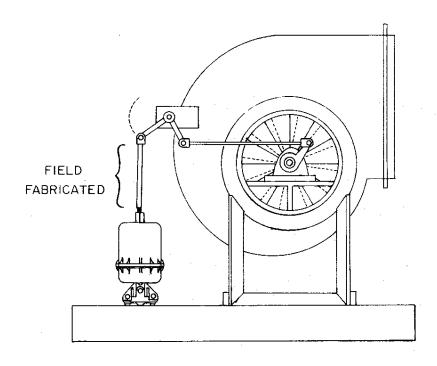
See Pipe and Bar Stock Applications (page 6)
